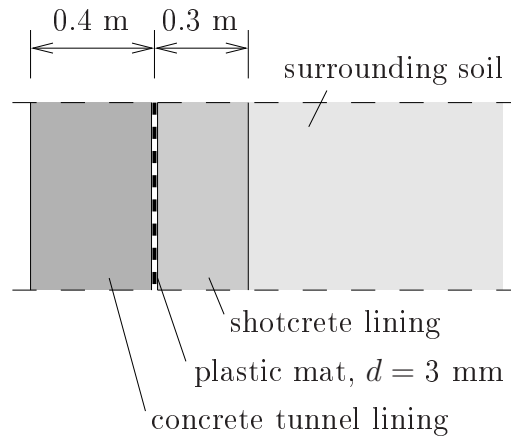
Cross-section of the considered tunnel lining of the Lainzer tunnel (Austria)
